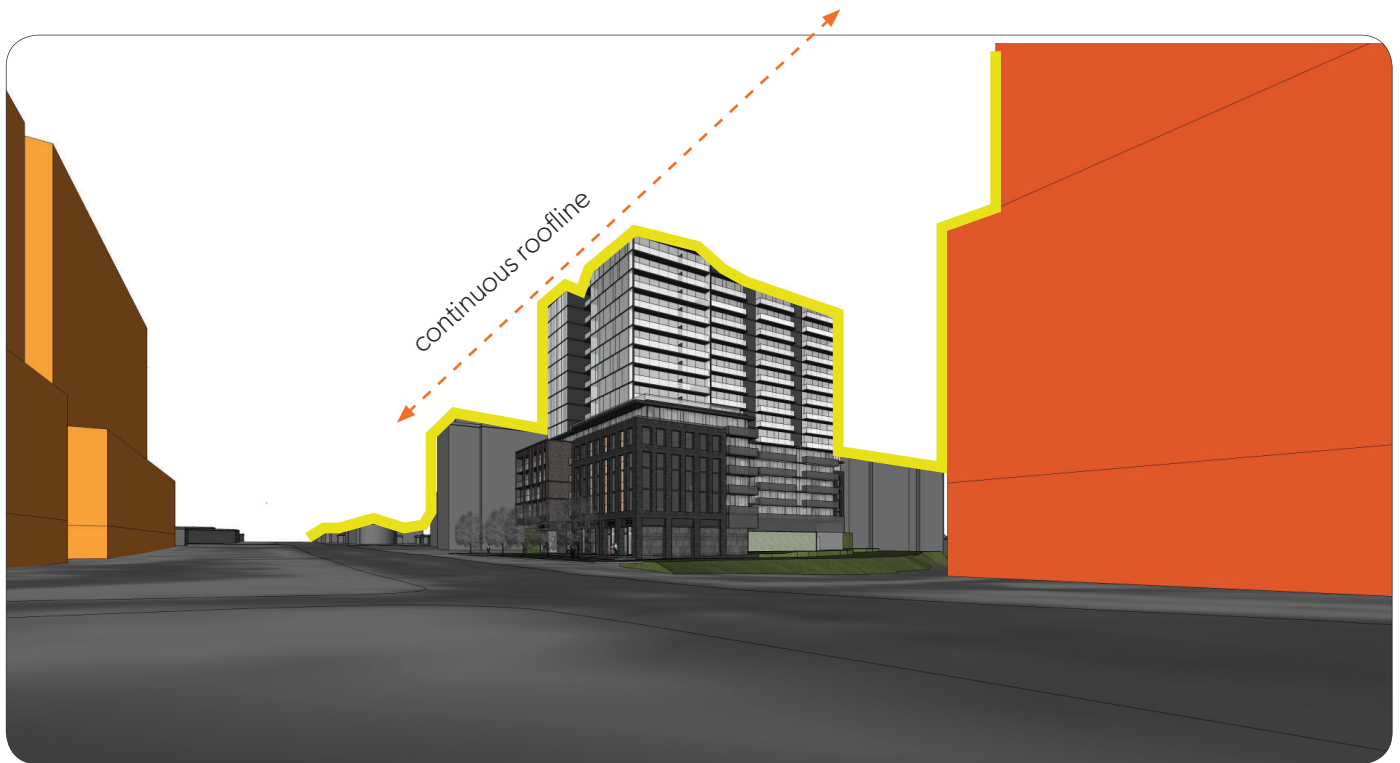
Proposed Street Section Showing Future Street Condition and Building Relationships: Prepared by Studio JCI.
